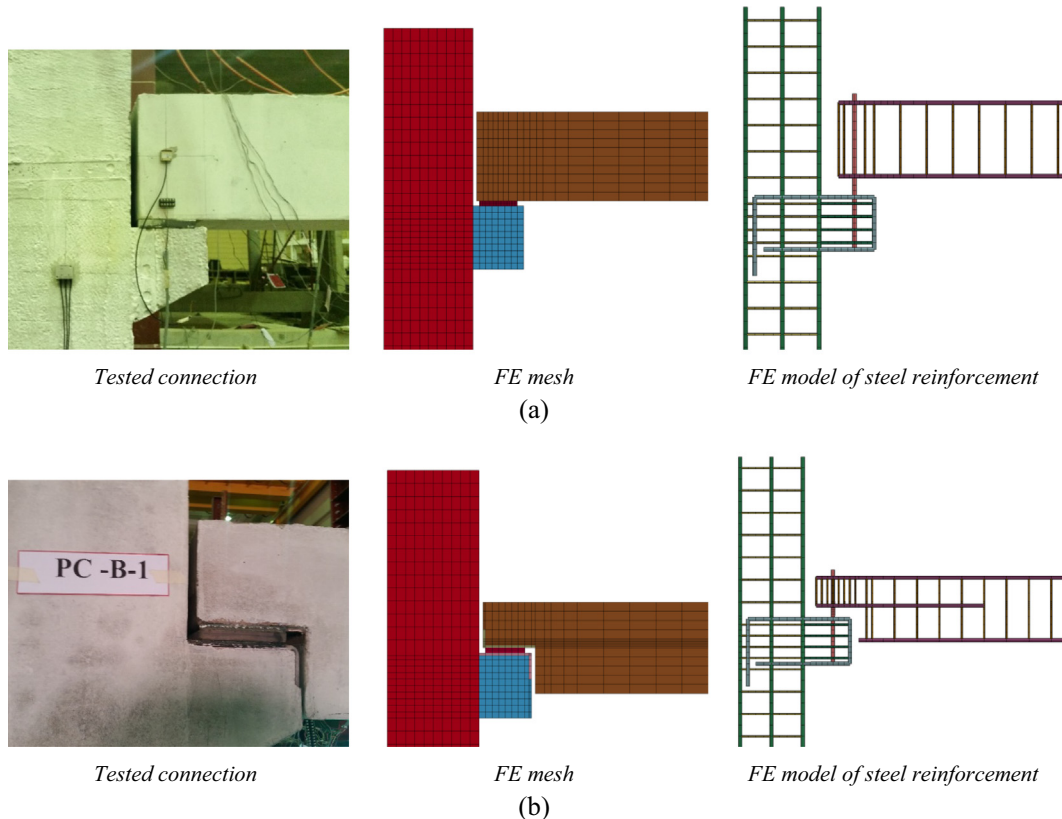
Tested precast beam-column connections: Geometry & FE model: (a) Specimen PC-A; (b) Specimen PC-B.
